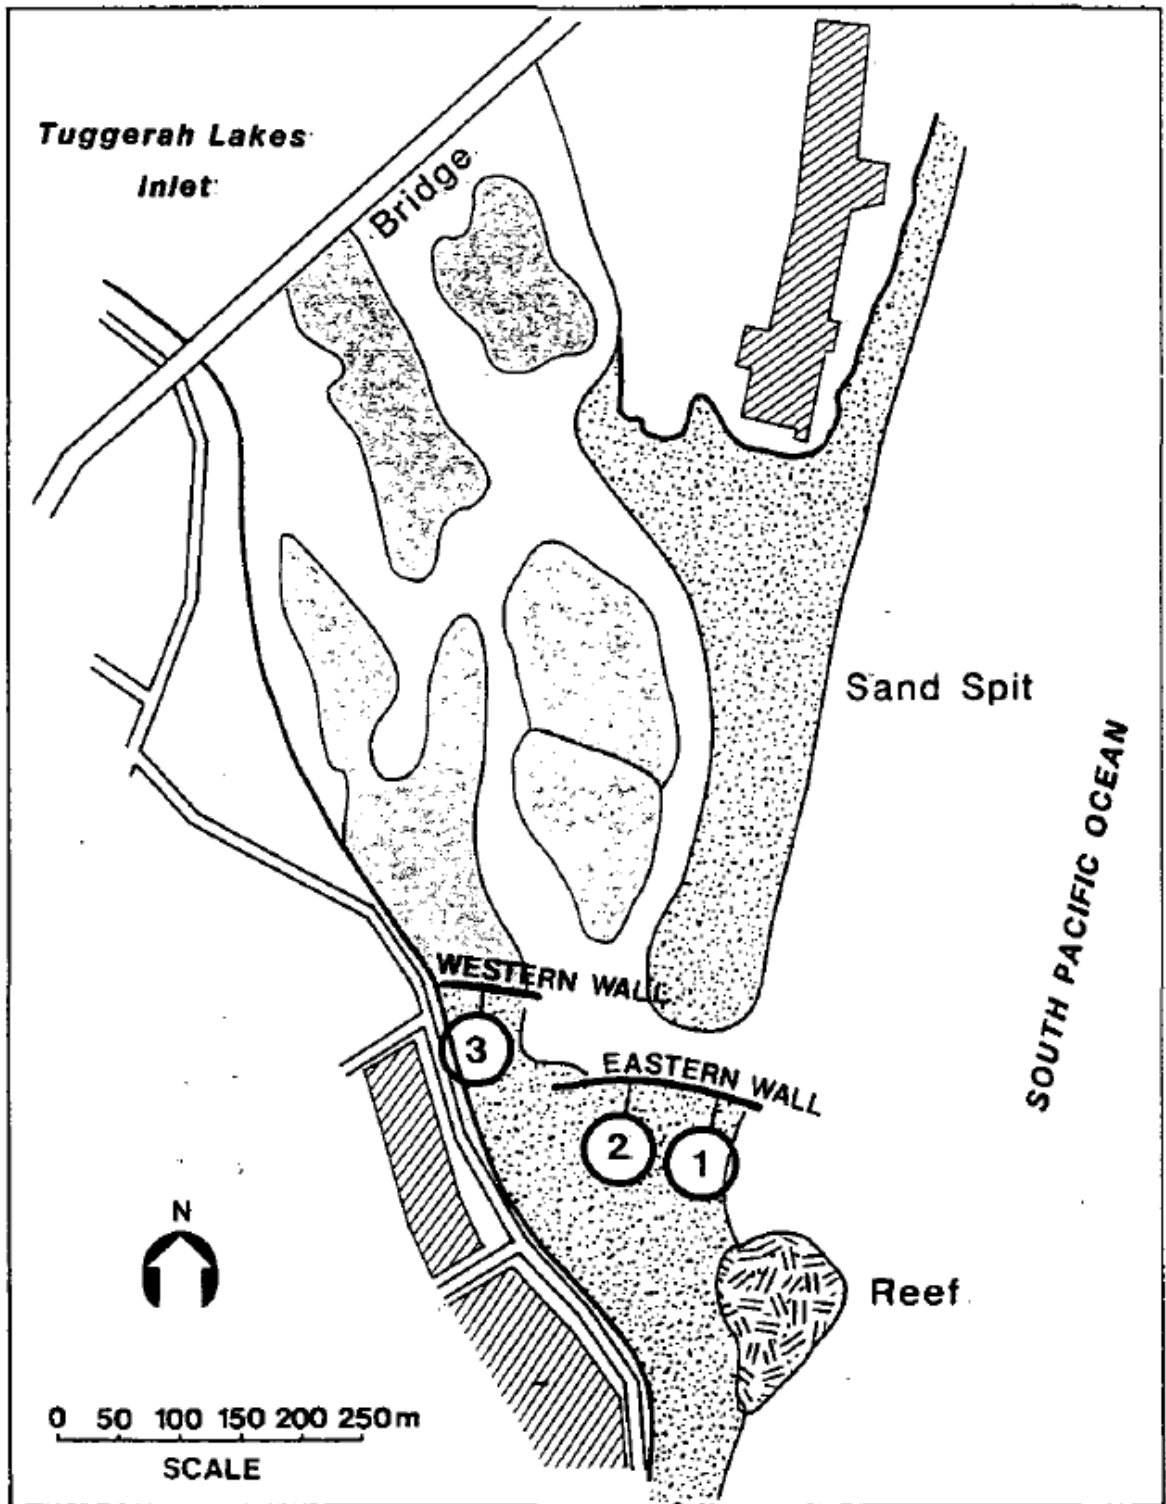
Restraining wall concept (Patterson Britton 1988)
